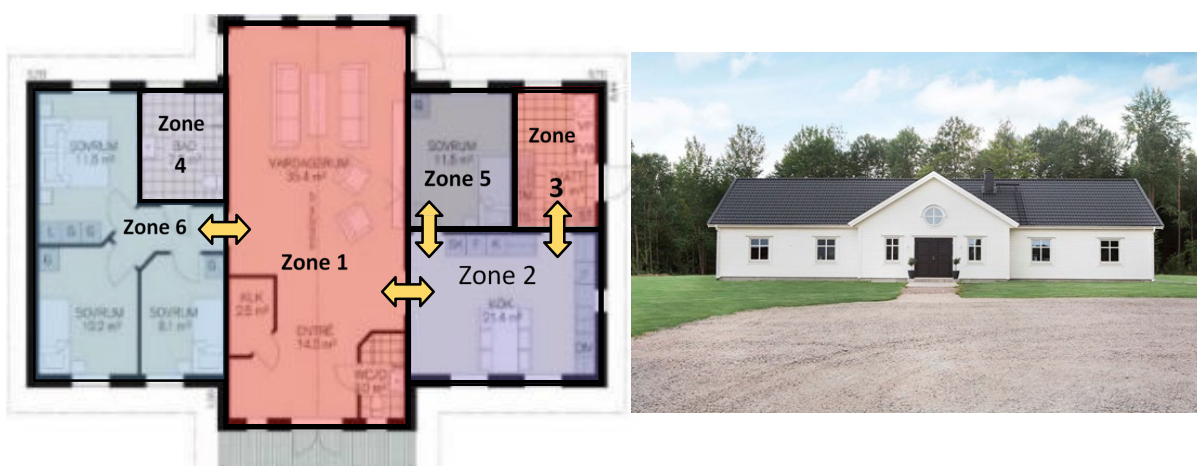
Layout of the building that is modelled with 6 thermal zones (left side) and the actual front view of the house (right side).
